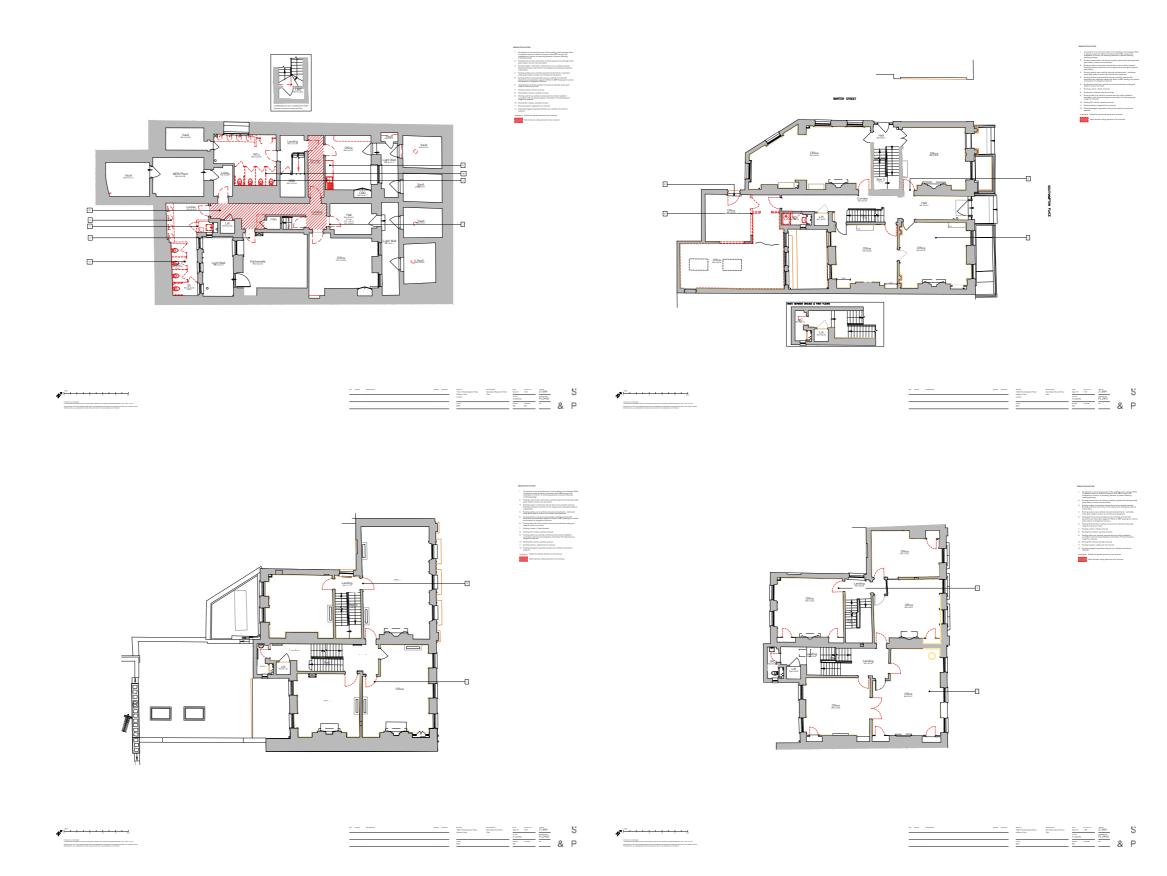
(Above, Left) - Basement Floor Plan, Demolition as Proposed (S & P Architects, 2021). Figure 83 (Above, Right) - Ground Floor Plan, Demolition as Proposed (S & P Architects, 2021). Figure 84 (Below, Left) - First Floor Plan, Demolition as Proposed (S & P Architects, 2021). Figure 85 (Below, Right) - Second Floor Plan, Demolition as Proposed (S & P Architects, 2021).
